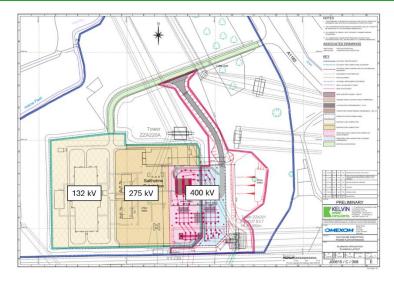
Planning Layout of Saltholme Substation (2020)
